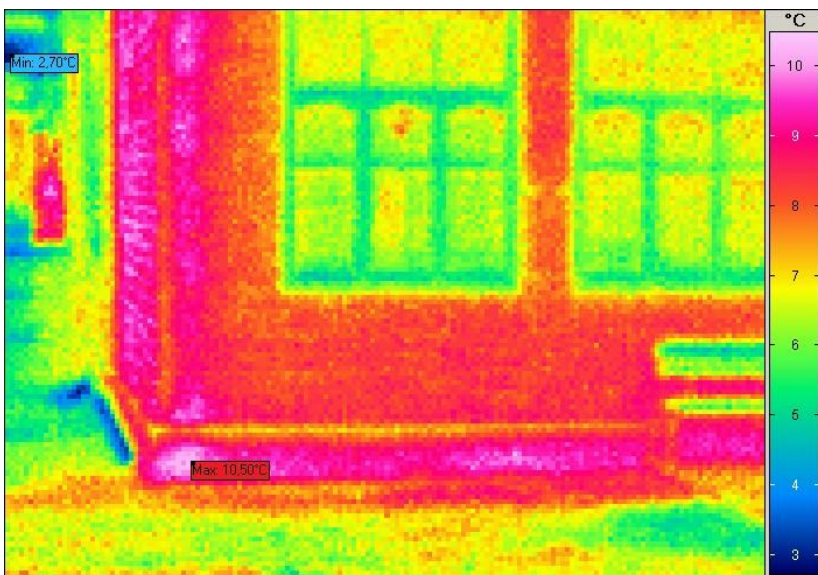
House with double glazed windows and insulated floor and walls, Murgab
